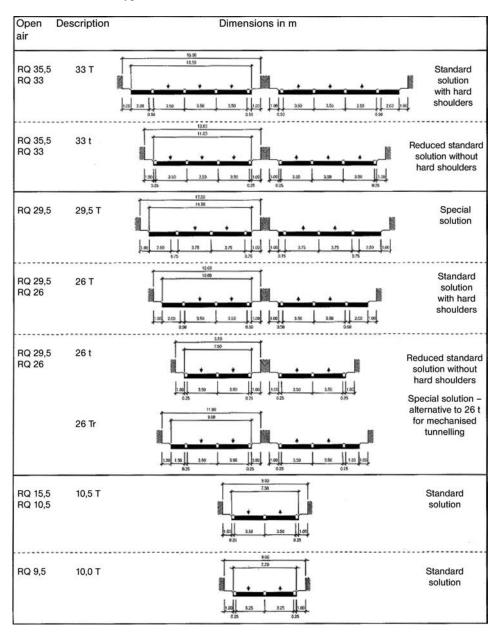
Standard cross-sections for road tunnels [33, 77].
